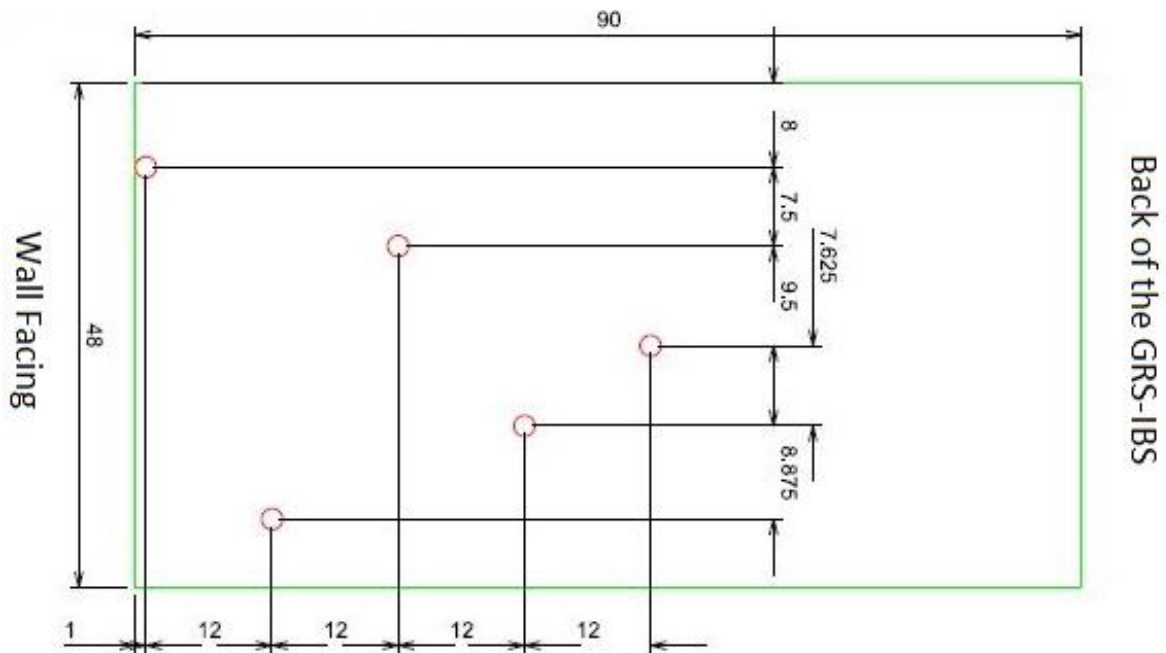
Plan view of WP connections to geotextile reinforcement at H = 91-inch above the foundation slab of GRS Abutment Model #2 (dimensions are in inches)
